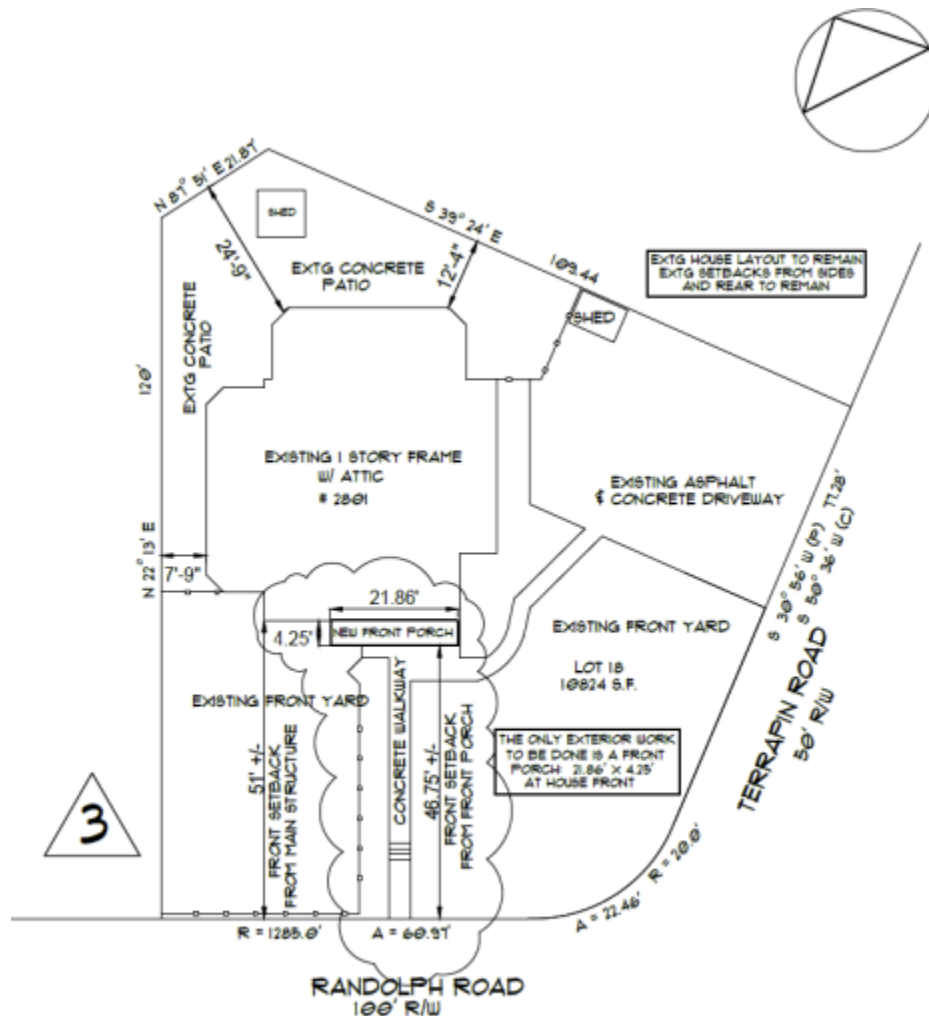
Existing Site Conditions with Proposed Porch Conversion
